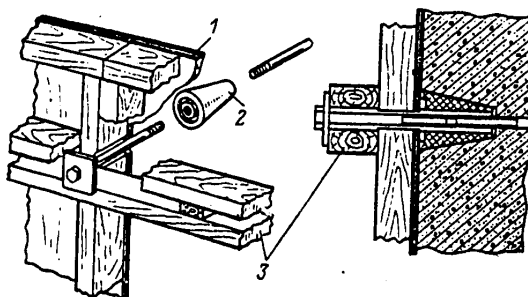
Fastening of stock form using anchor bolts and conical couplings
